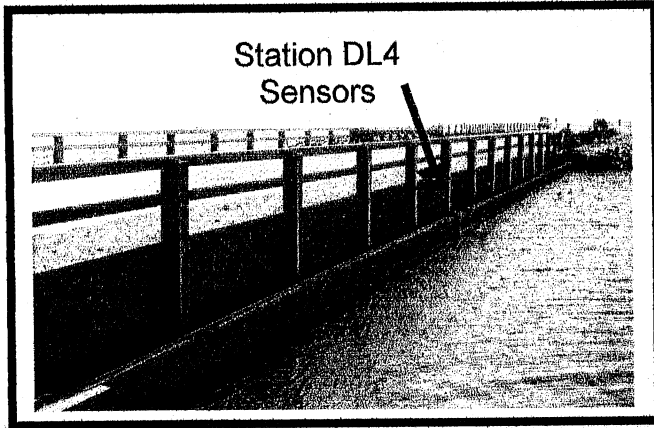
Station DL4 located on east side of Highway 20 bridge.
